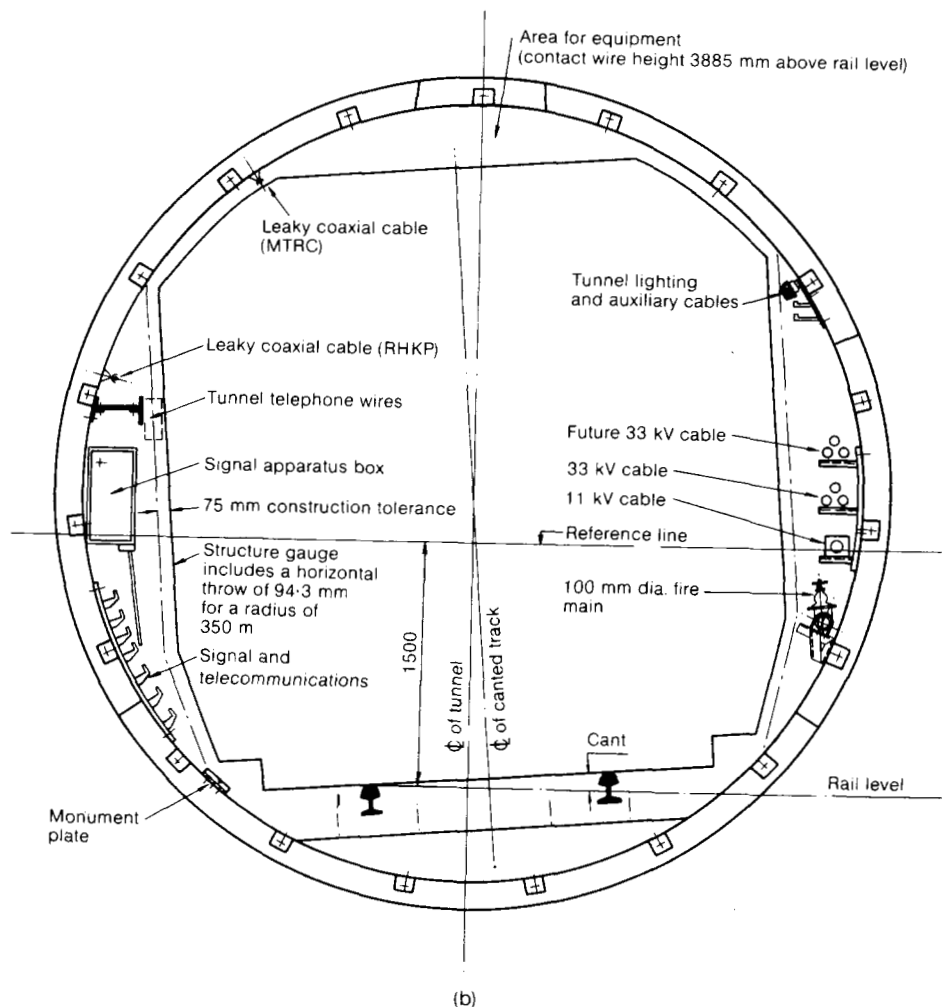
(above and right) (dimensions in millimetres). (a) Kinematic envelope and structure gauge; (b) typical tunnel cross-section
